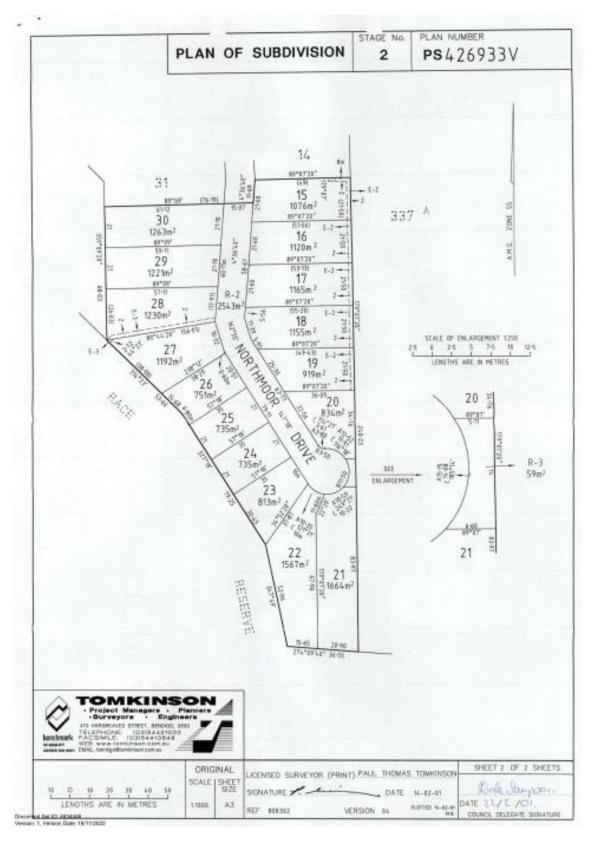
The certified subdivision plan (Stage 2) under planning permit DS/104/1998
